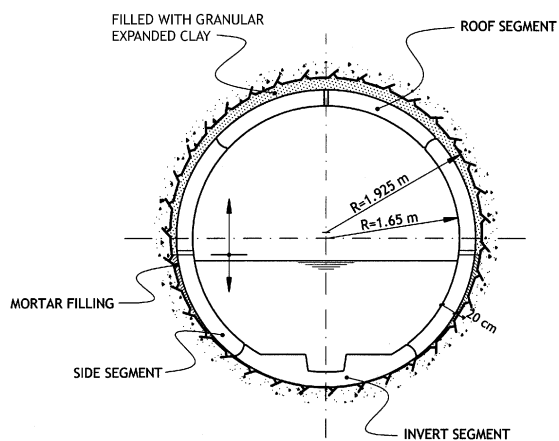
Typical cross section of the Langeten flood diversion tunnel
